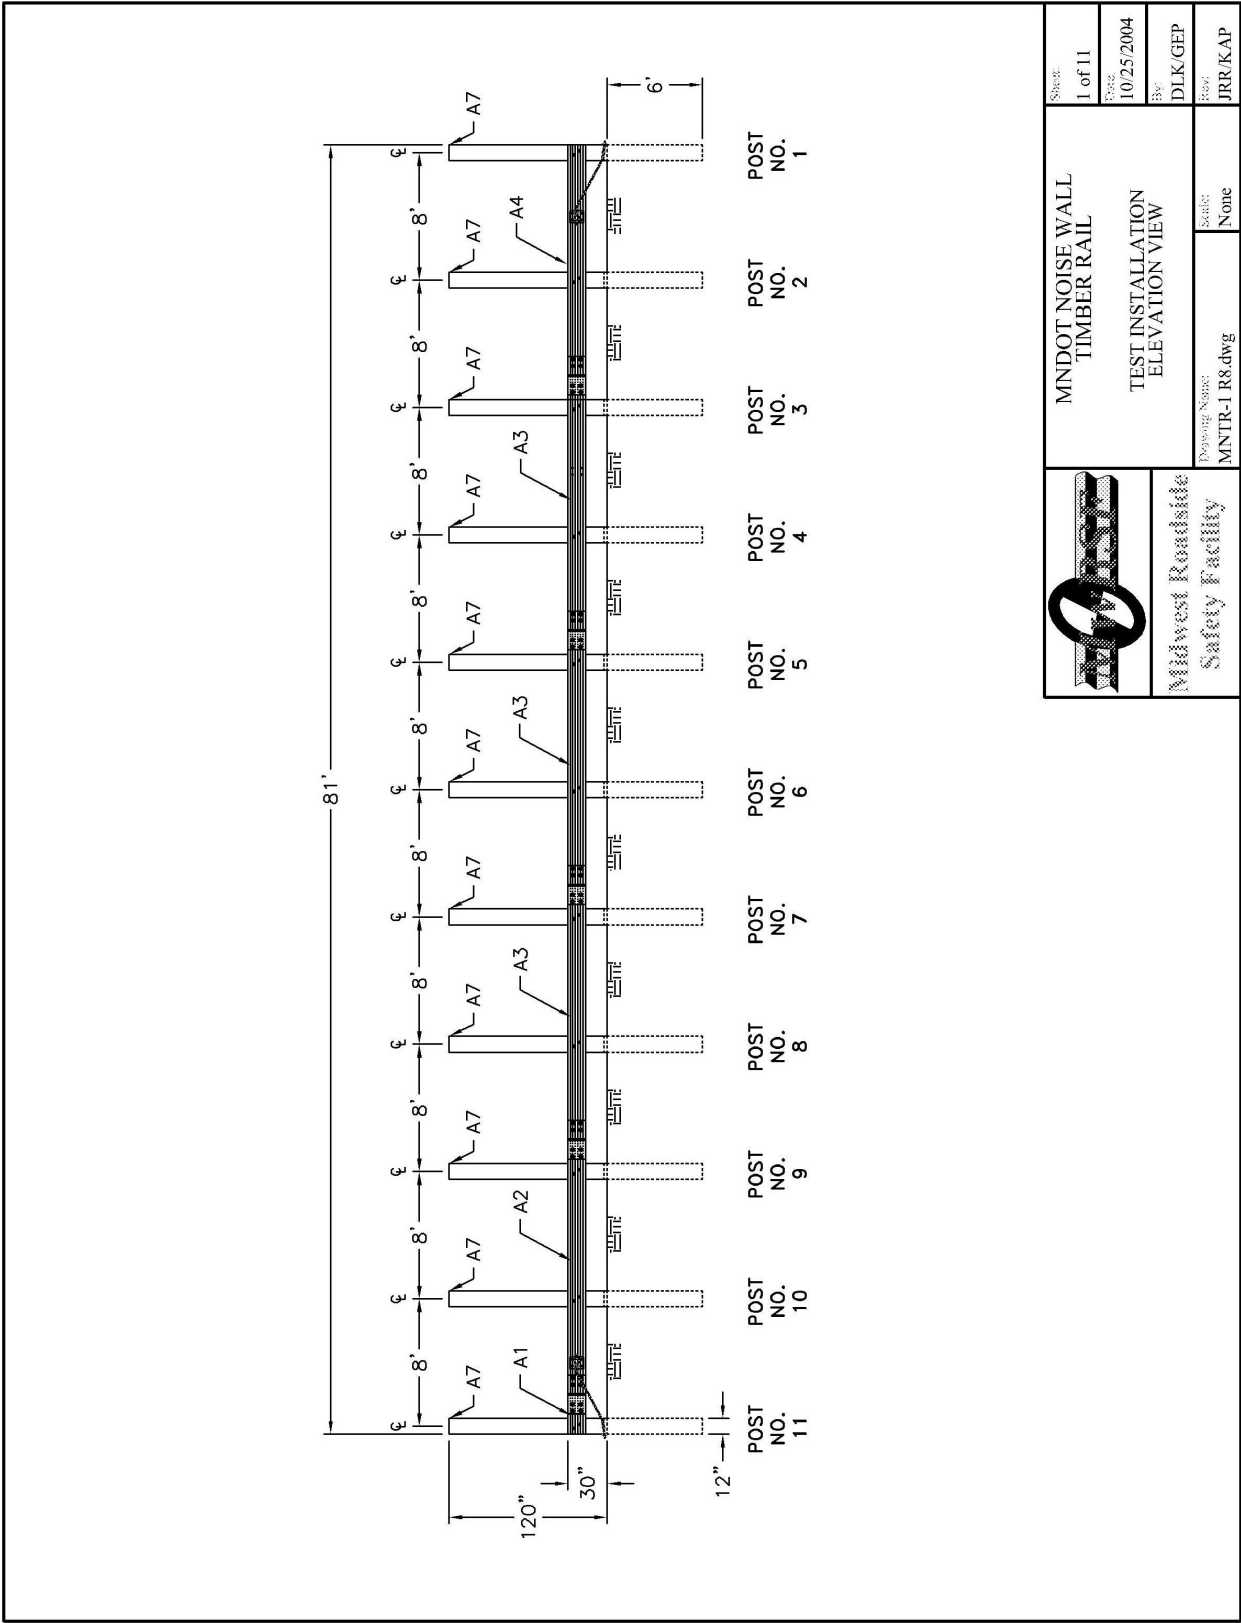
Layout for Mn/DOT's Timber Rub Rail for Noise Barriers - Elevation View (English)
